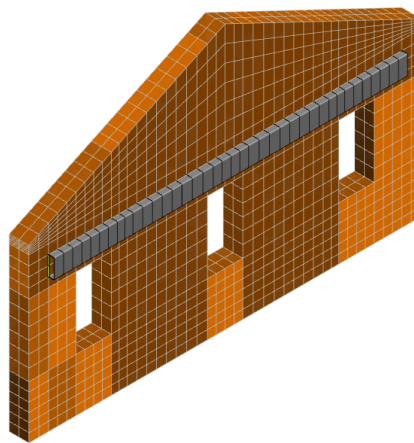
Isometric View of Fog Room Gabled Wall, HSB Scheme
